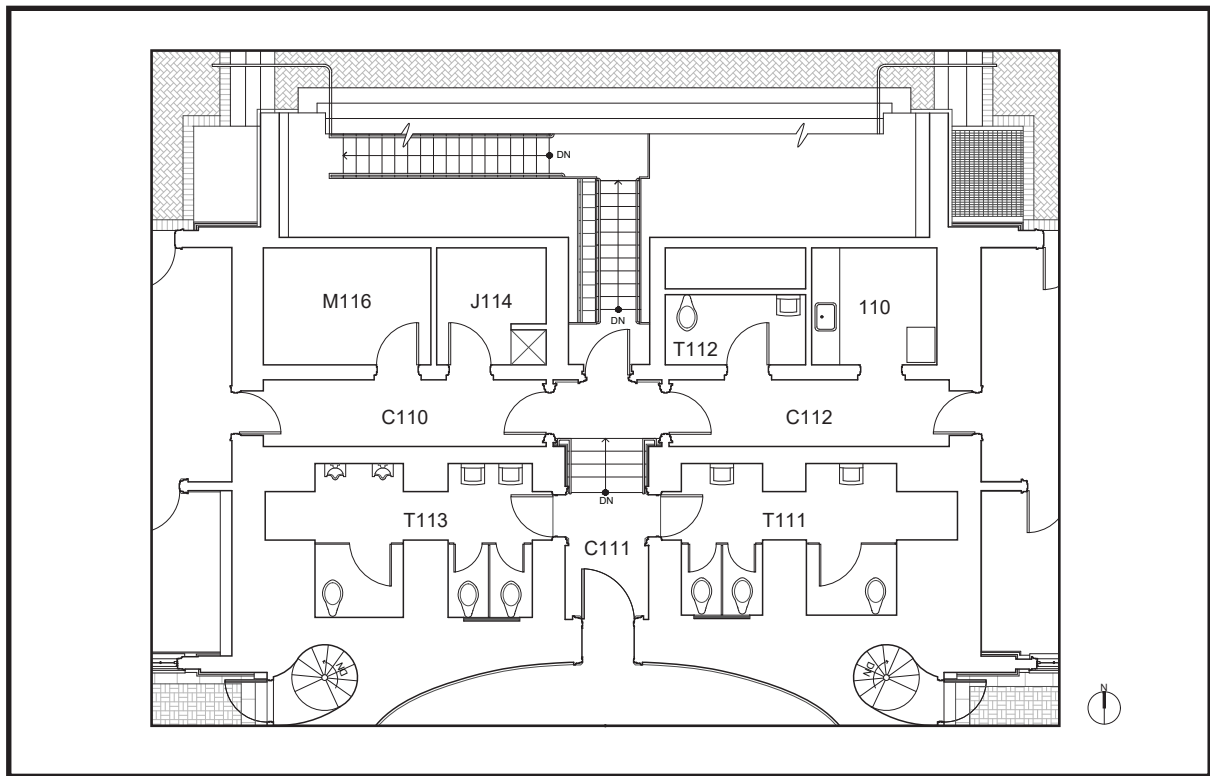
Detail, ground-floor plan of the rooms below the north portico (not to scale).
